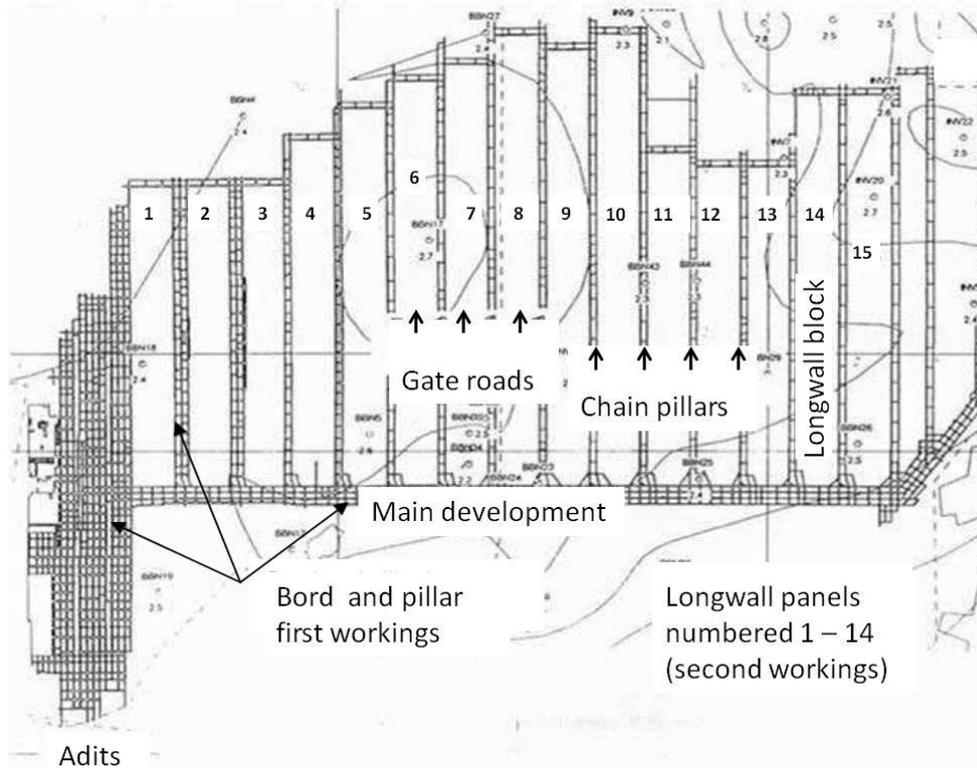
Plan layout of a typical longwall mine, also showing some bord and pillar first workings (© Copyright, NSW Department of Planning 2008).
